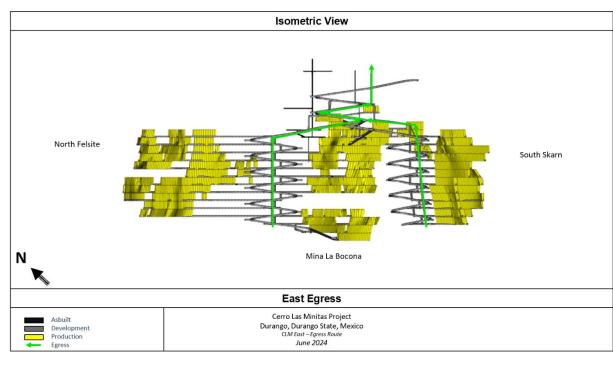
Egress Layout of Cerro Las Minitas – East
